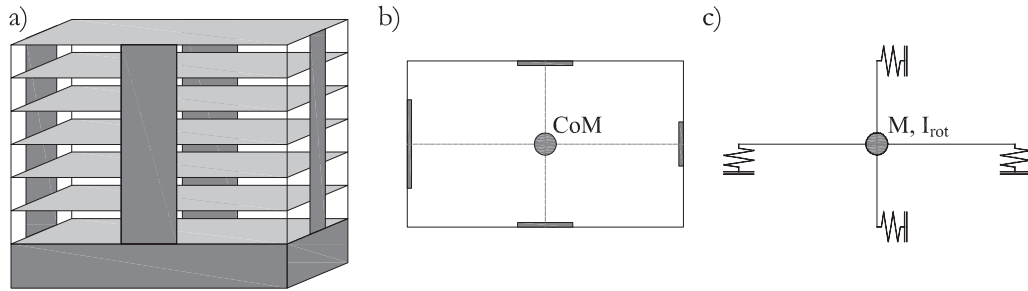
Approximation of a 3D system by a 2D system with springs and lumped mass: Example of a 3D wall-type structure (a), plan view of the asymmetric system (b), 2D system with springs and lumped mass (c).
